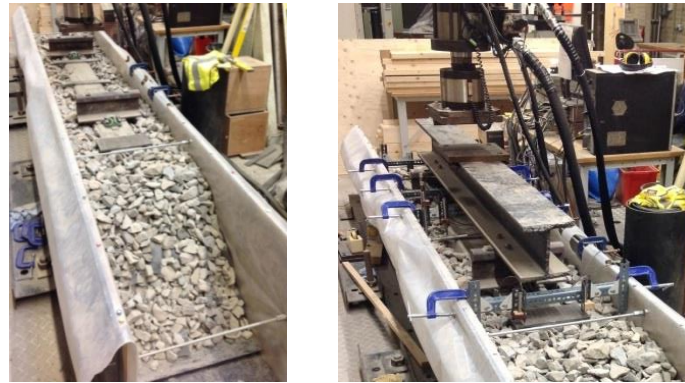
Test preparation (a) before placing loading beam and LVDTs and (b) ready for testing
